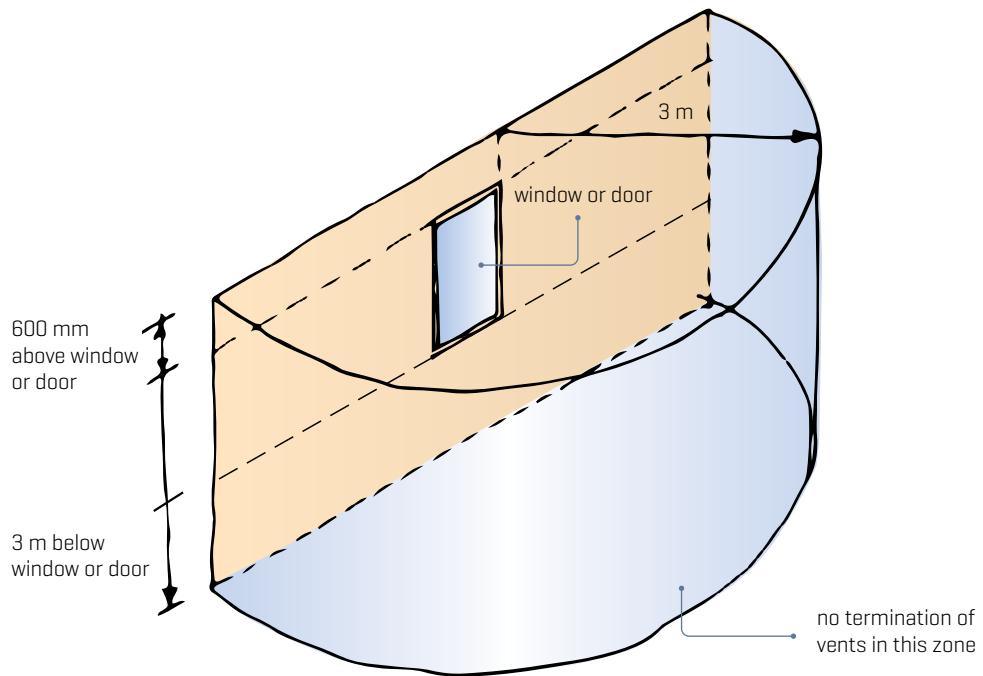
Termination point of vent 600 mm above and 3 m horizontally from a window, door or roof light.
